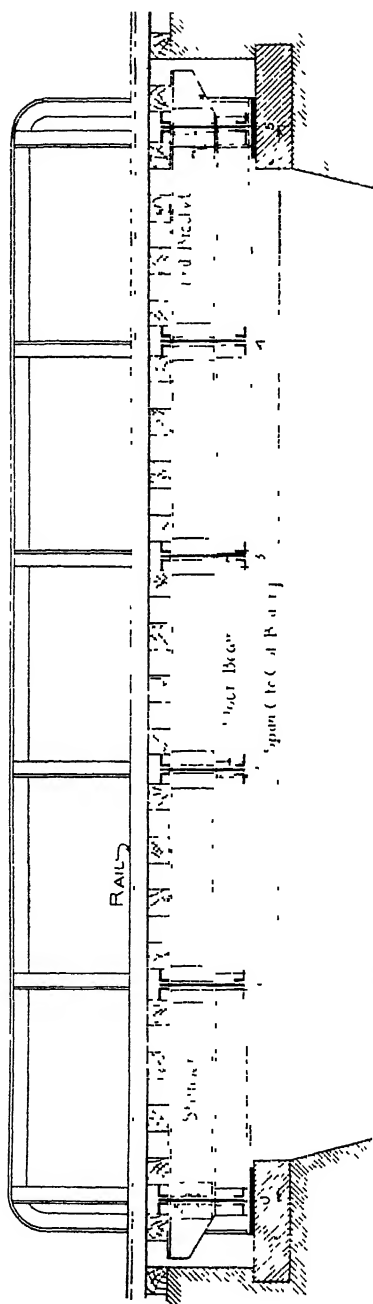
Longitudinal Section of a Through Plate-Girder Railway Bridge
